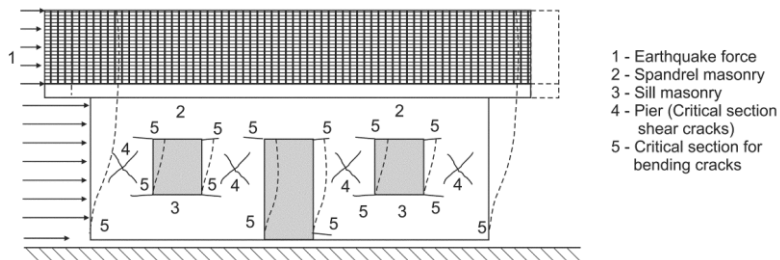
Critical failure modes in a masonry wall with openings [15]
